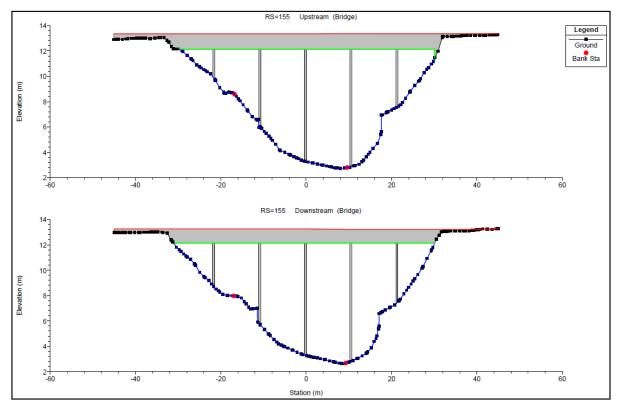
Westmead Hospital Access Road Bridge Section in HEC-RAS model
